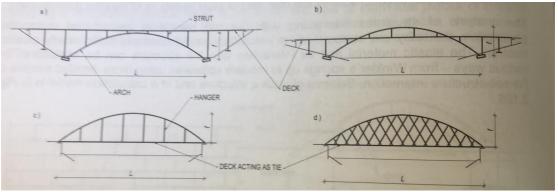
PRINCIPAL MEMBERS ON AN ARCH BRIDGE
